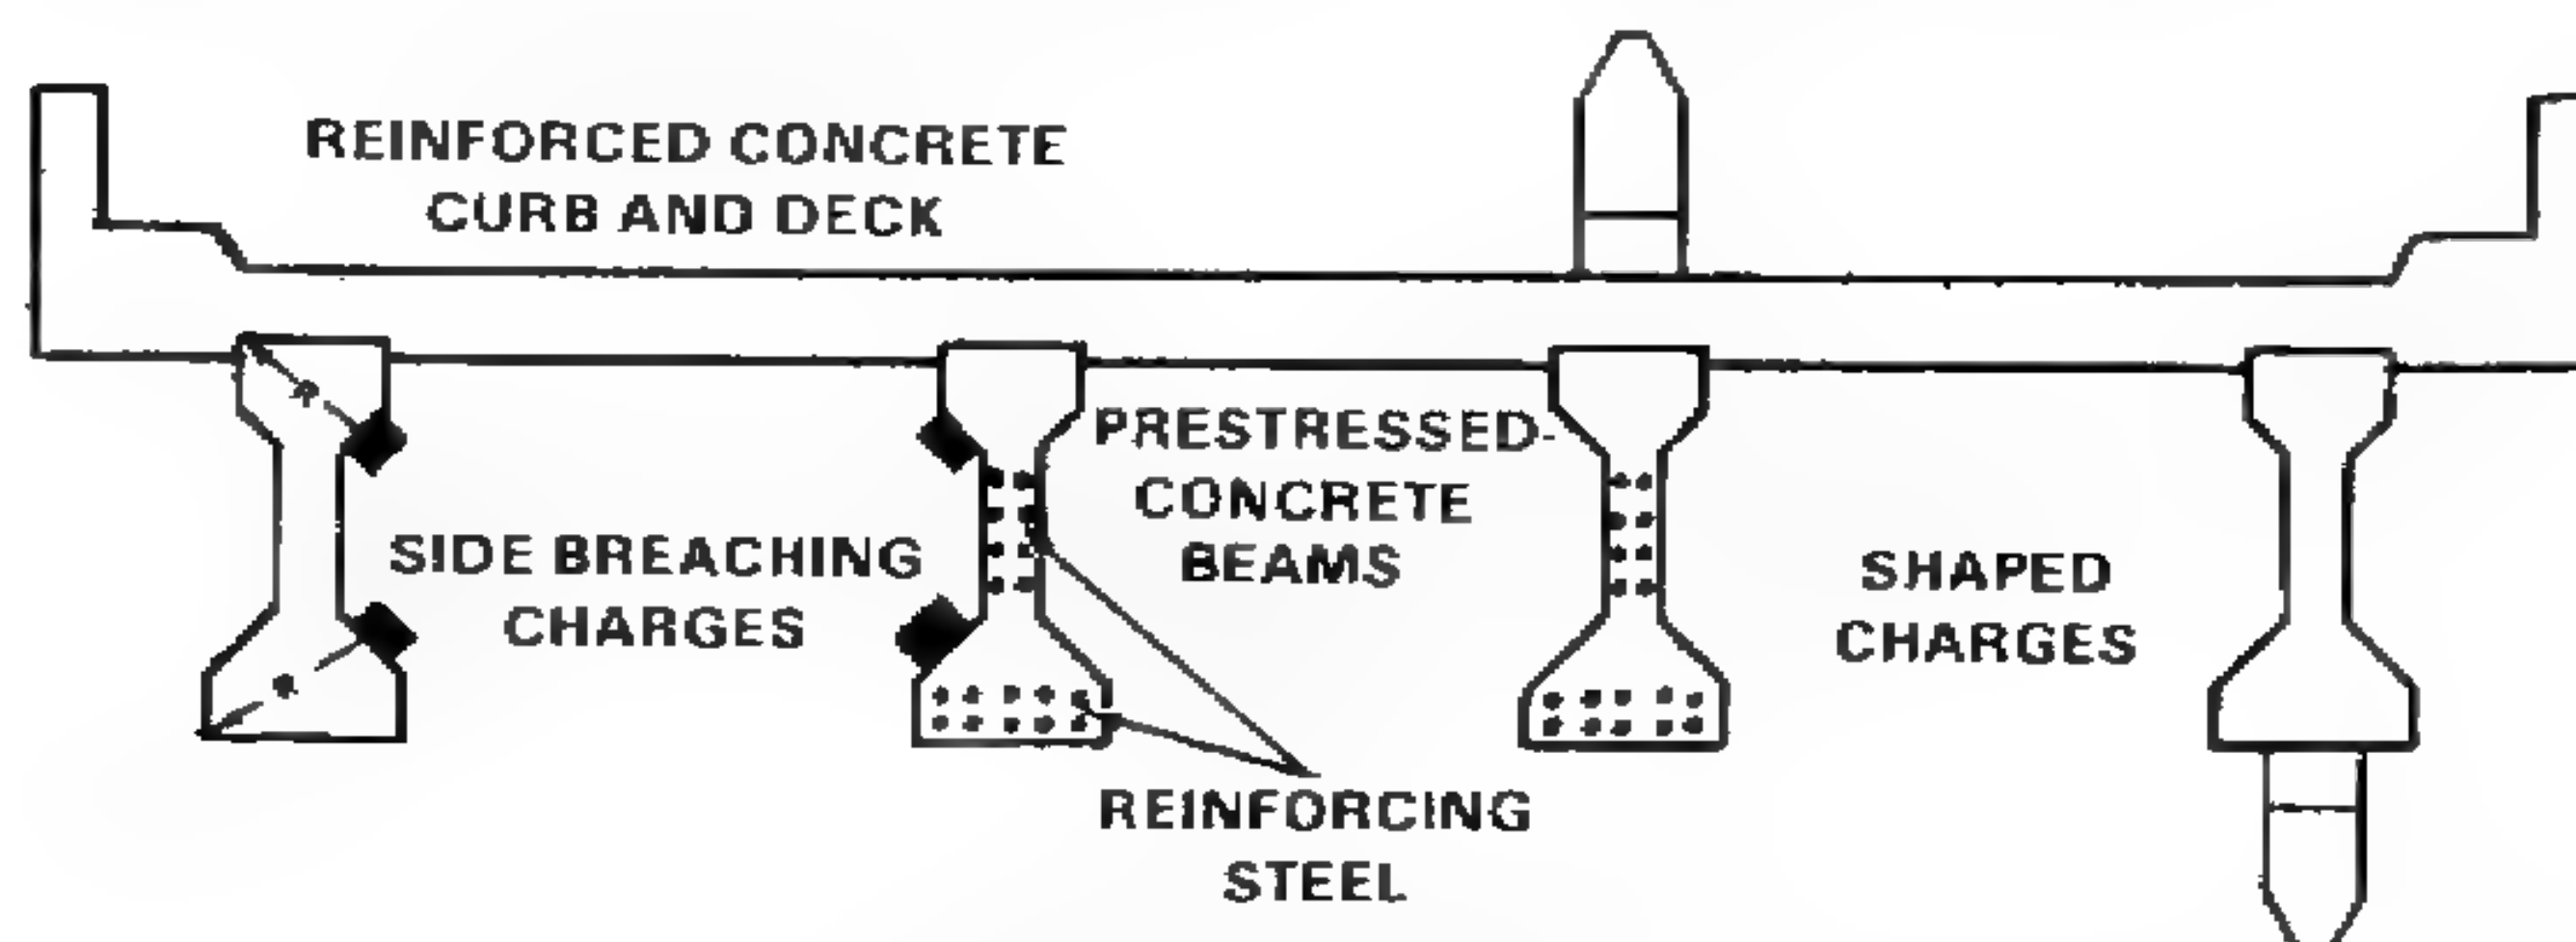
Demolition of reinforced-concrete T-beam superstructures
